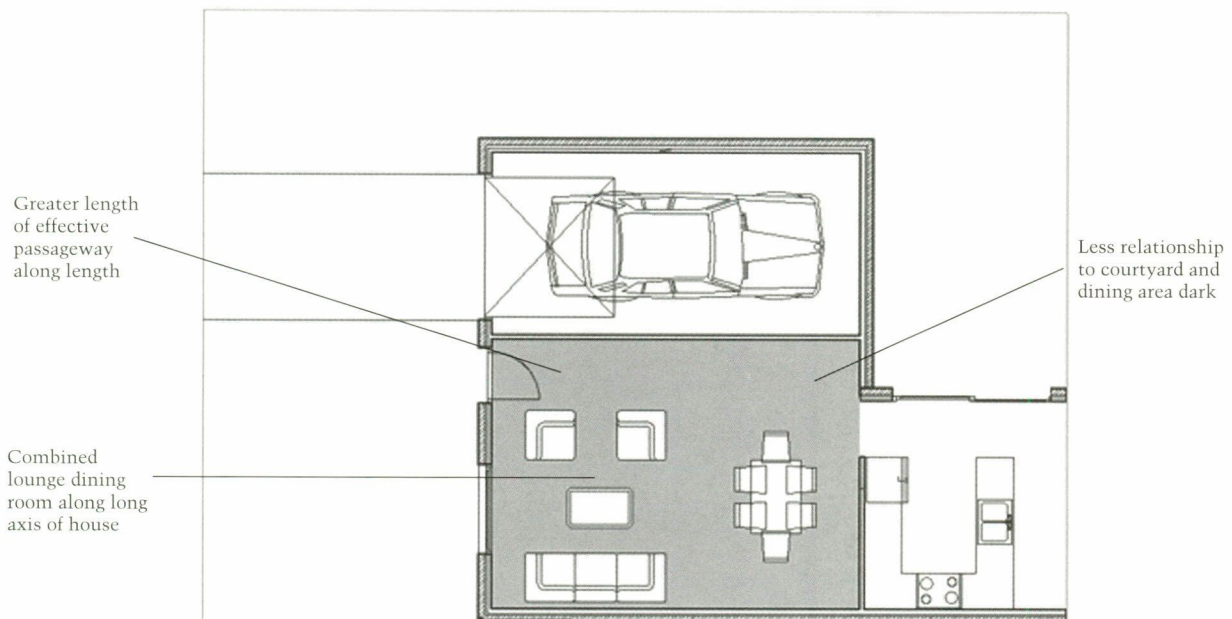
A TYPICAL LAYOUT FOR LOUNGE AND LIVING ROOMS
